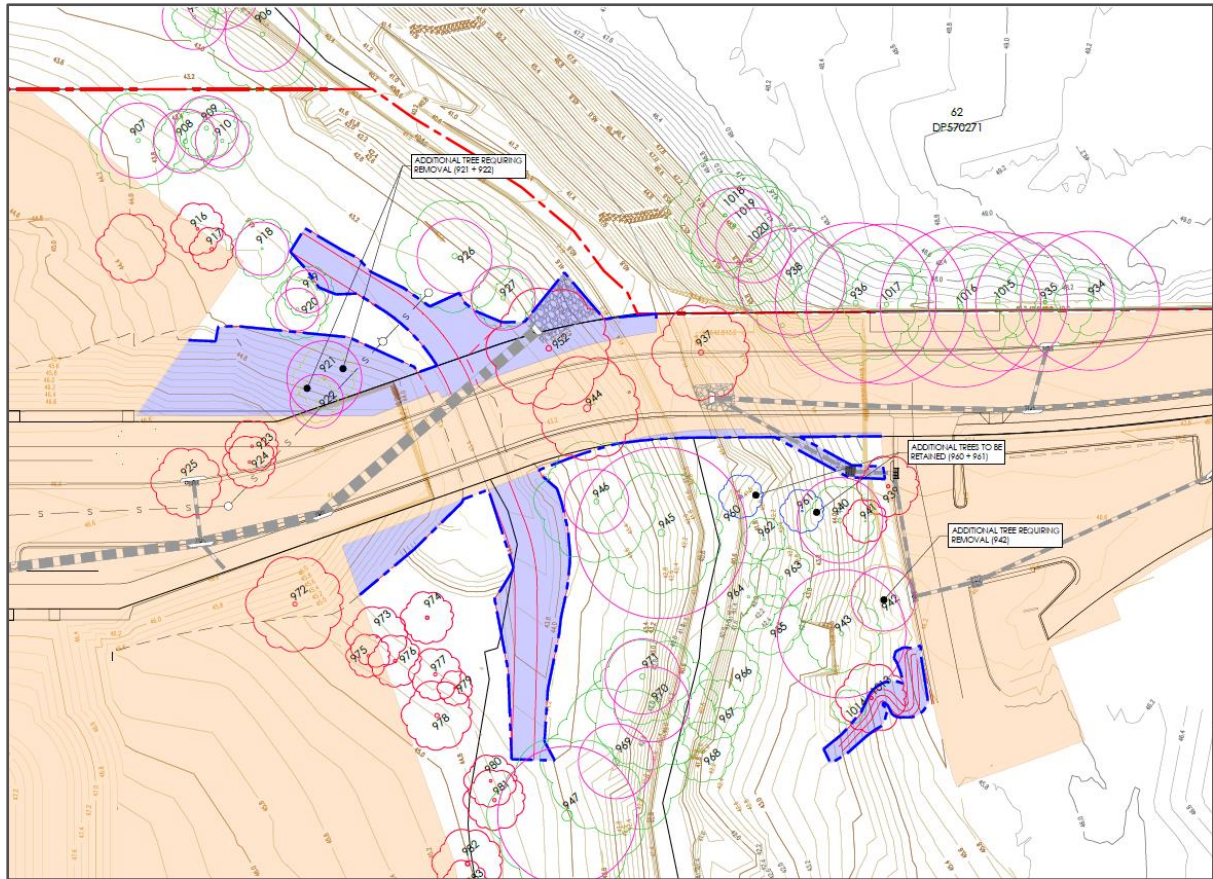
| Tree retention plan (Source: Applicant's Impact Assessment)
